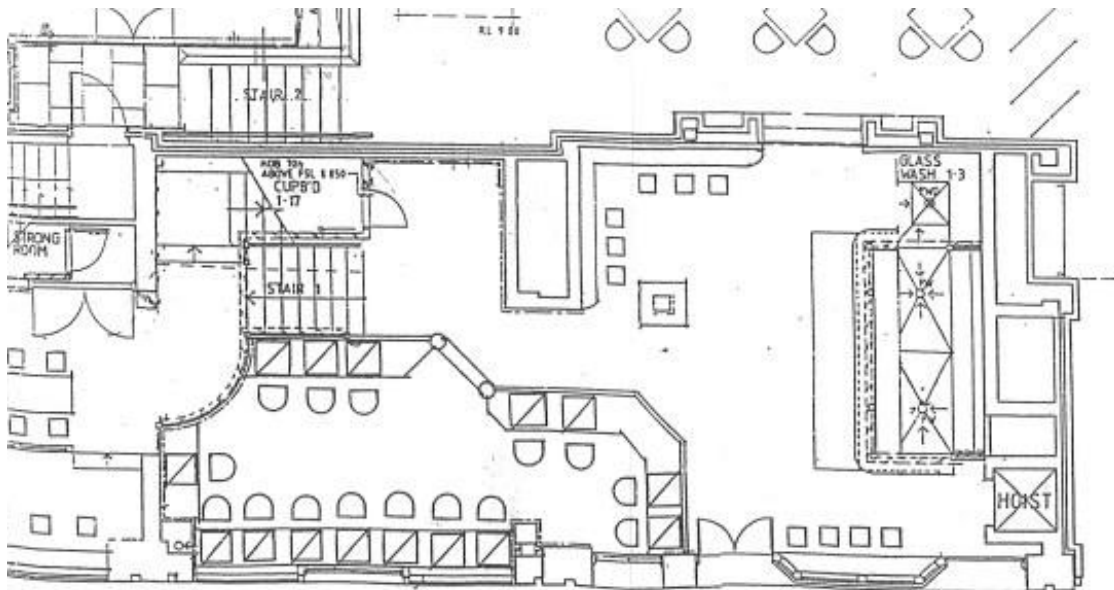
Modifications for new ground floor gaming area within the Commercial Building
